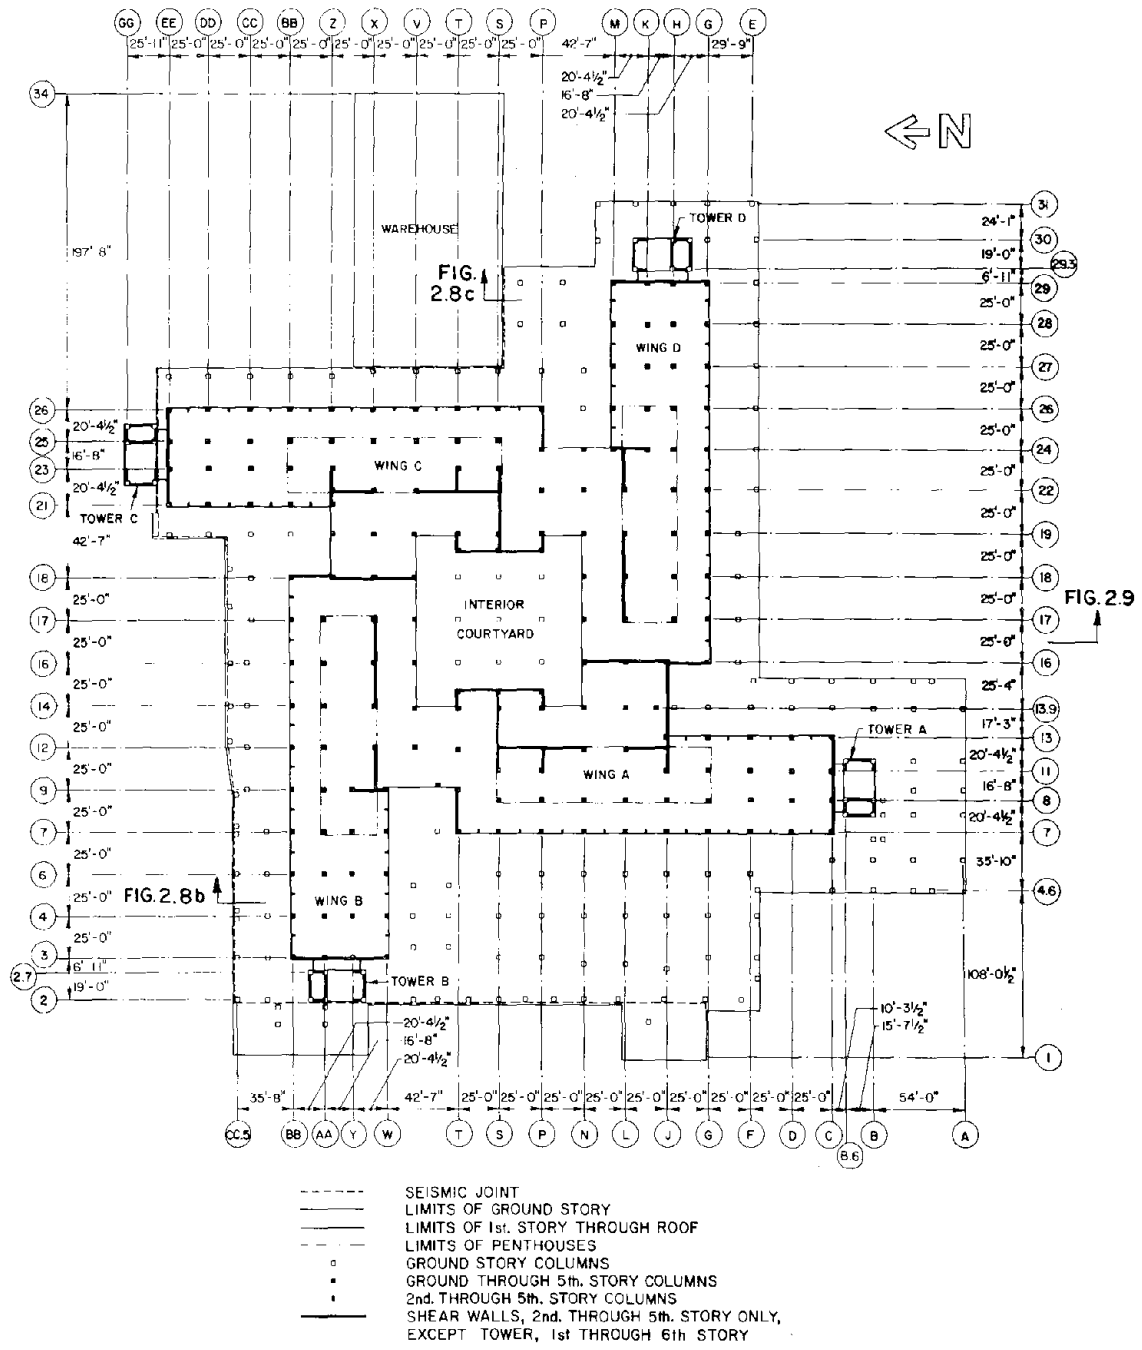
SCHEMATIC FLOOR PLAN OF MAIN BUILDING
